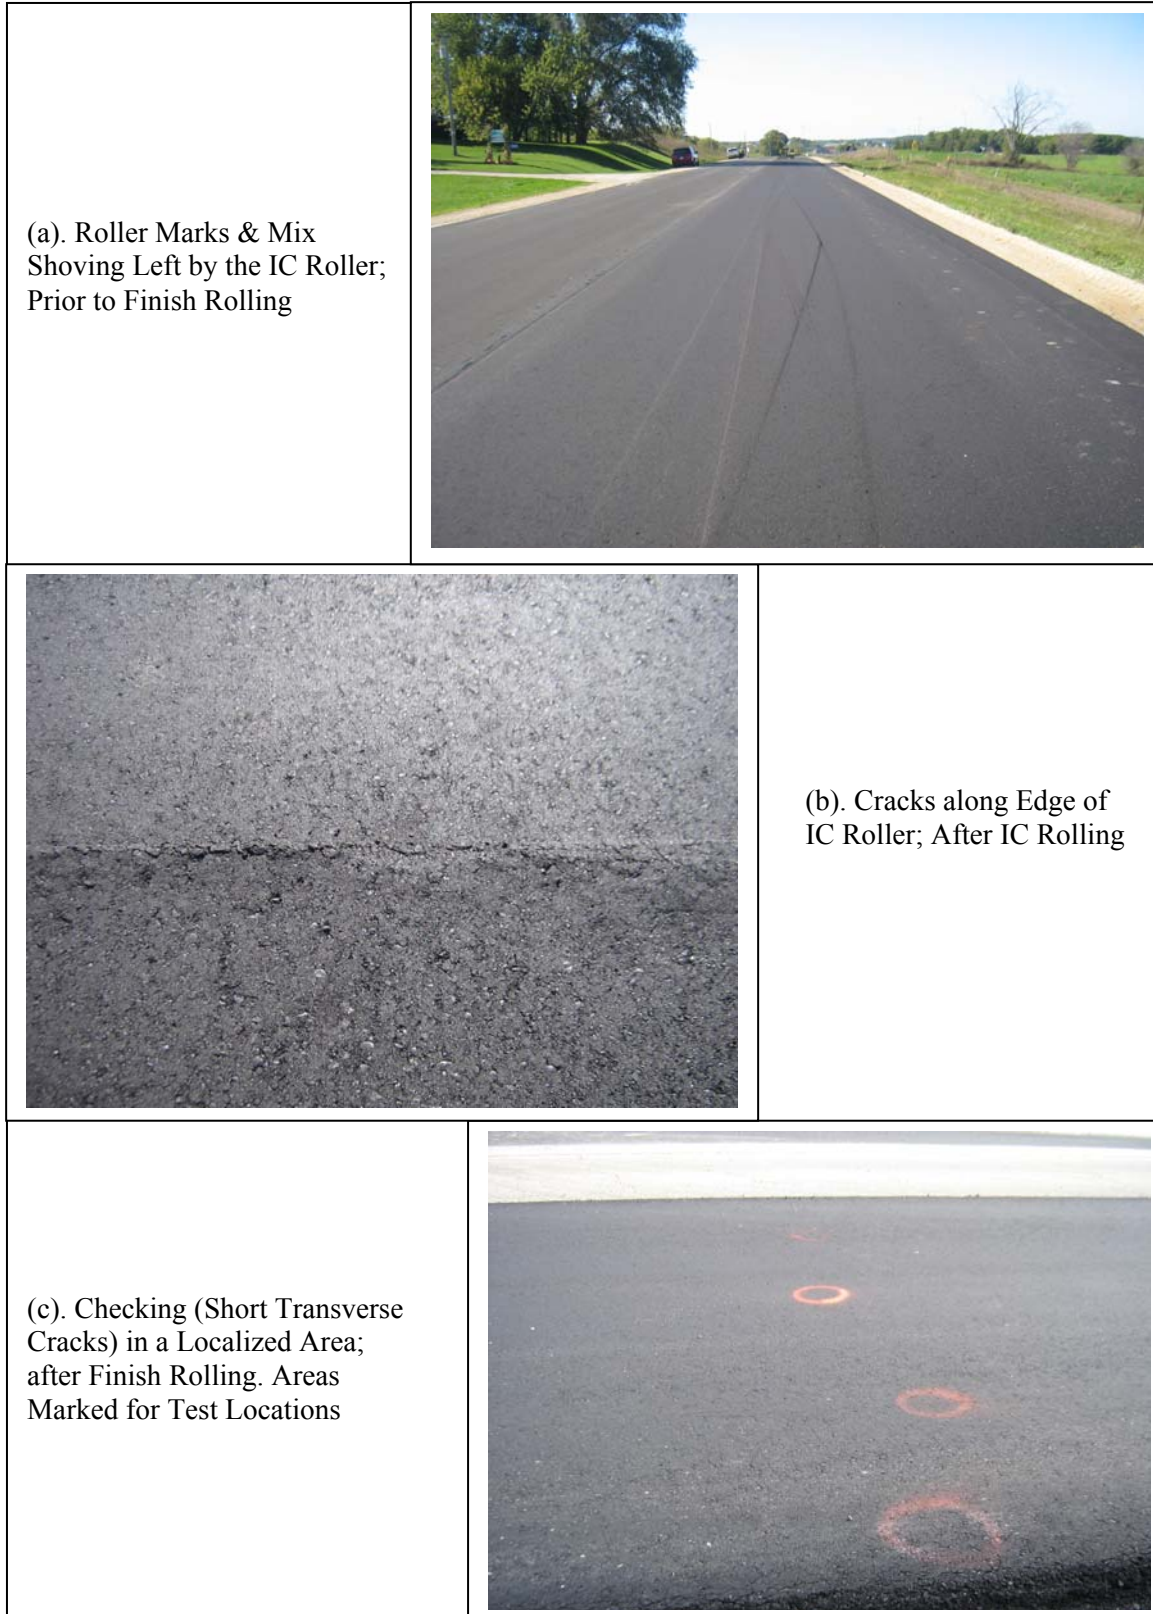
Example of Shoving or Shearing Along the Edge of the Roller Drum and Mix Checking
